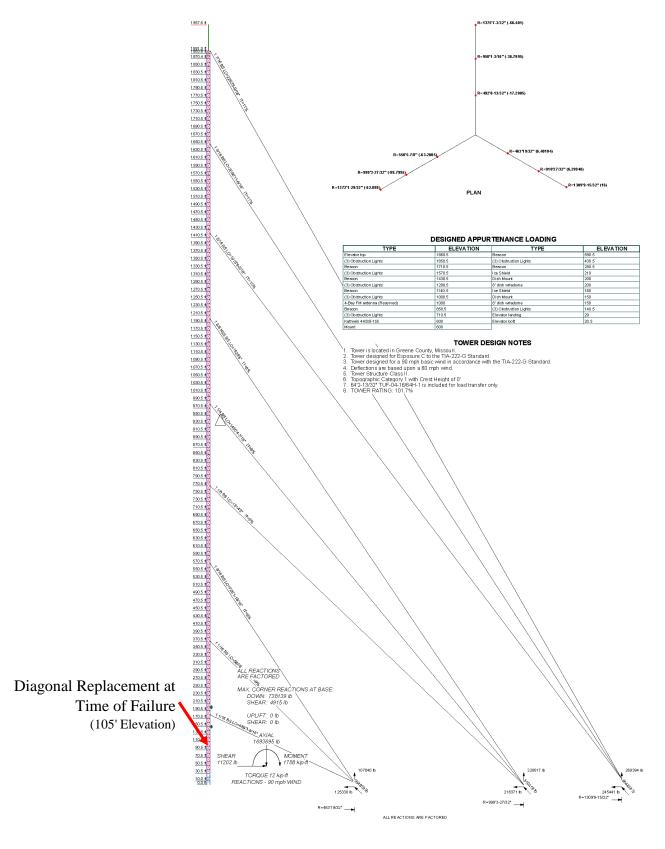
Tower Elevation (TCI Structural Analysis Report Appendix E-1)
